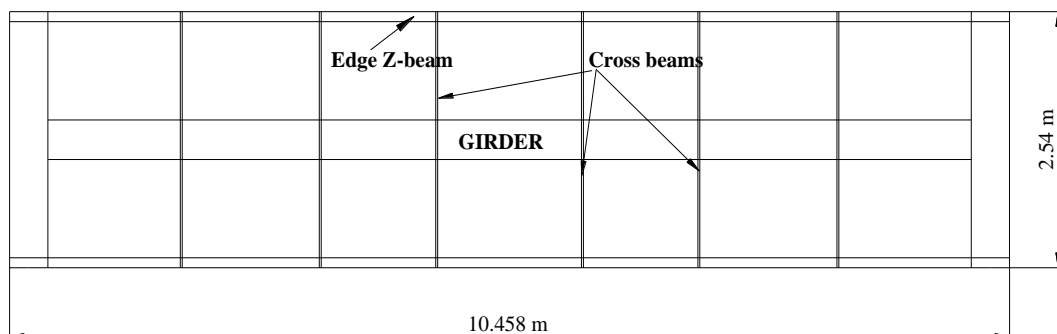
Plan view of FRW after cutting off the overhang parts for bridge construction
